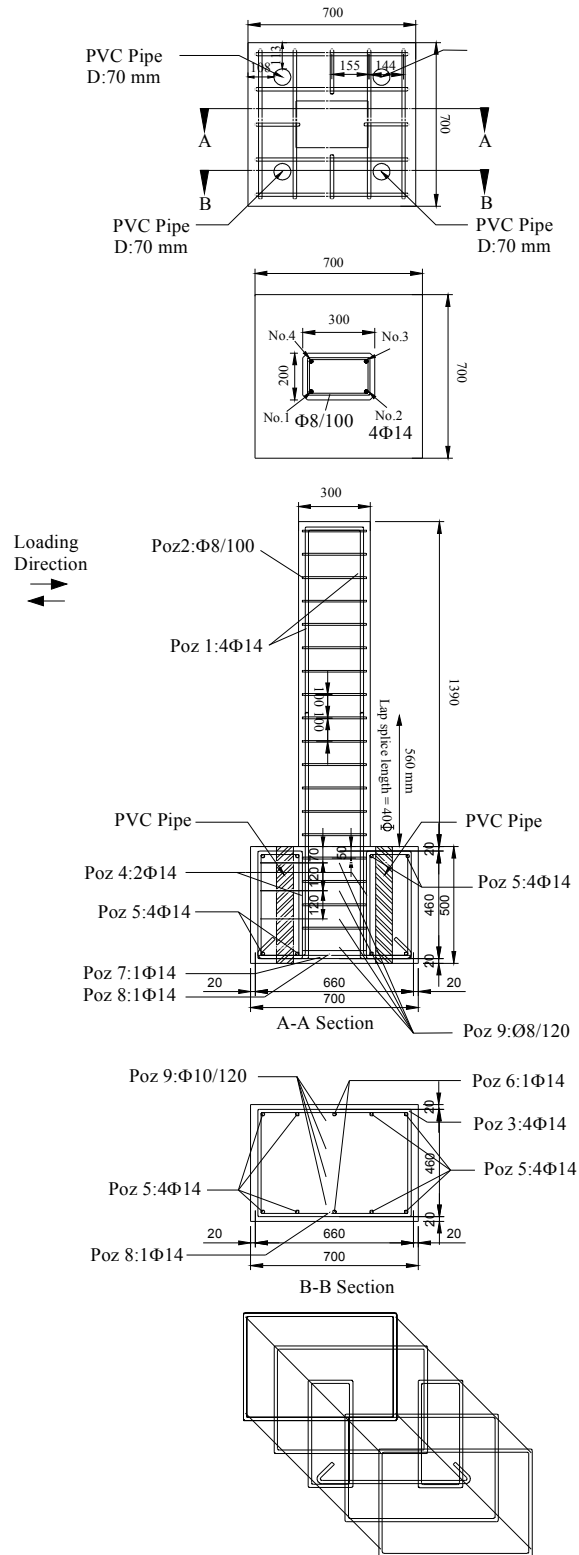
Reinforcing cage of the second type specimens (south side).
